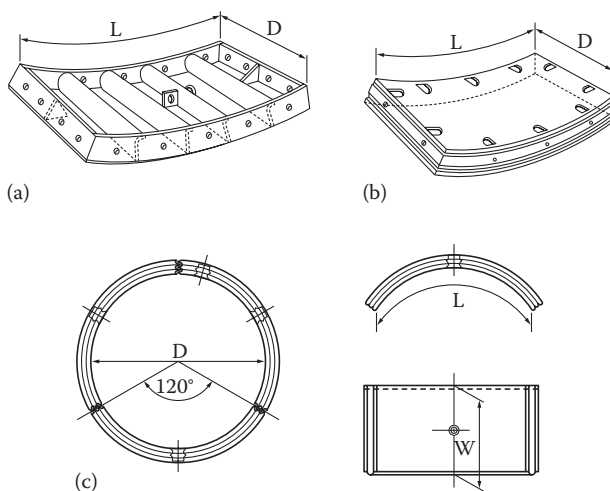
Tunneling segment: (a) steel segment, (b) concrete segment, and (c) resin concrete segment.
